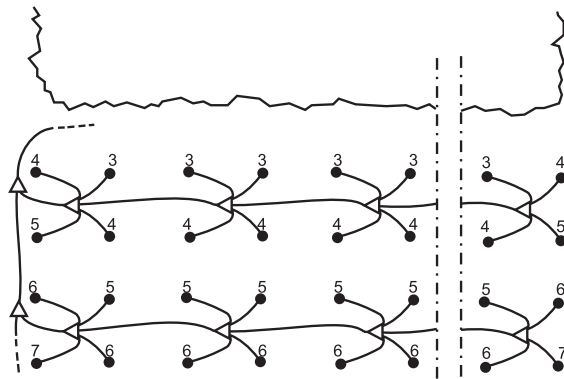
15. Non-electric system connected to connecting piece in bench blasting.
